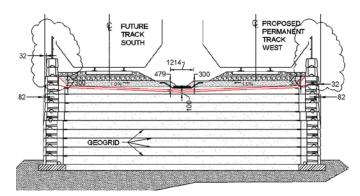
Cross-section through MSE wall with layers of overlapping and horizontal geogrids shown and the drain between the tracks to prevent ponding⁶.
